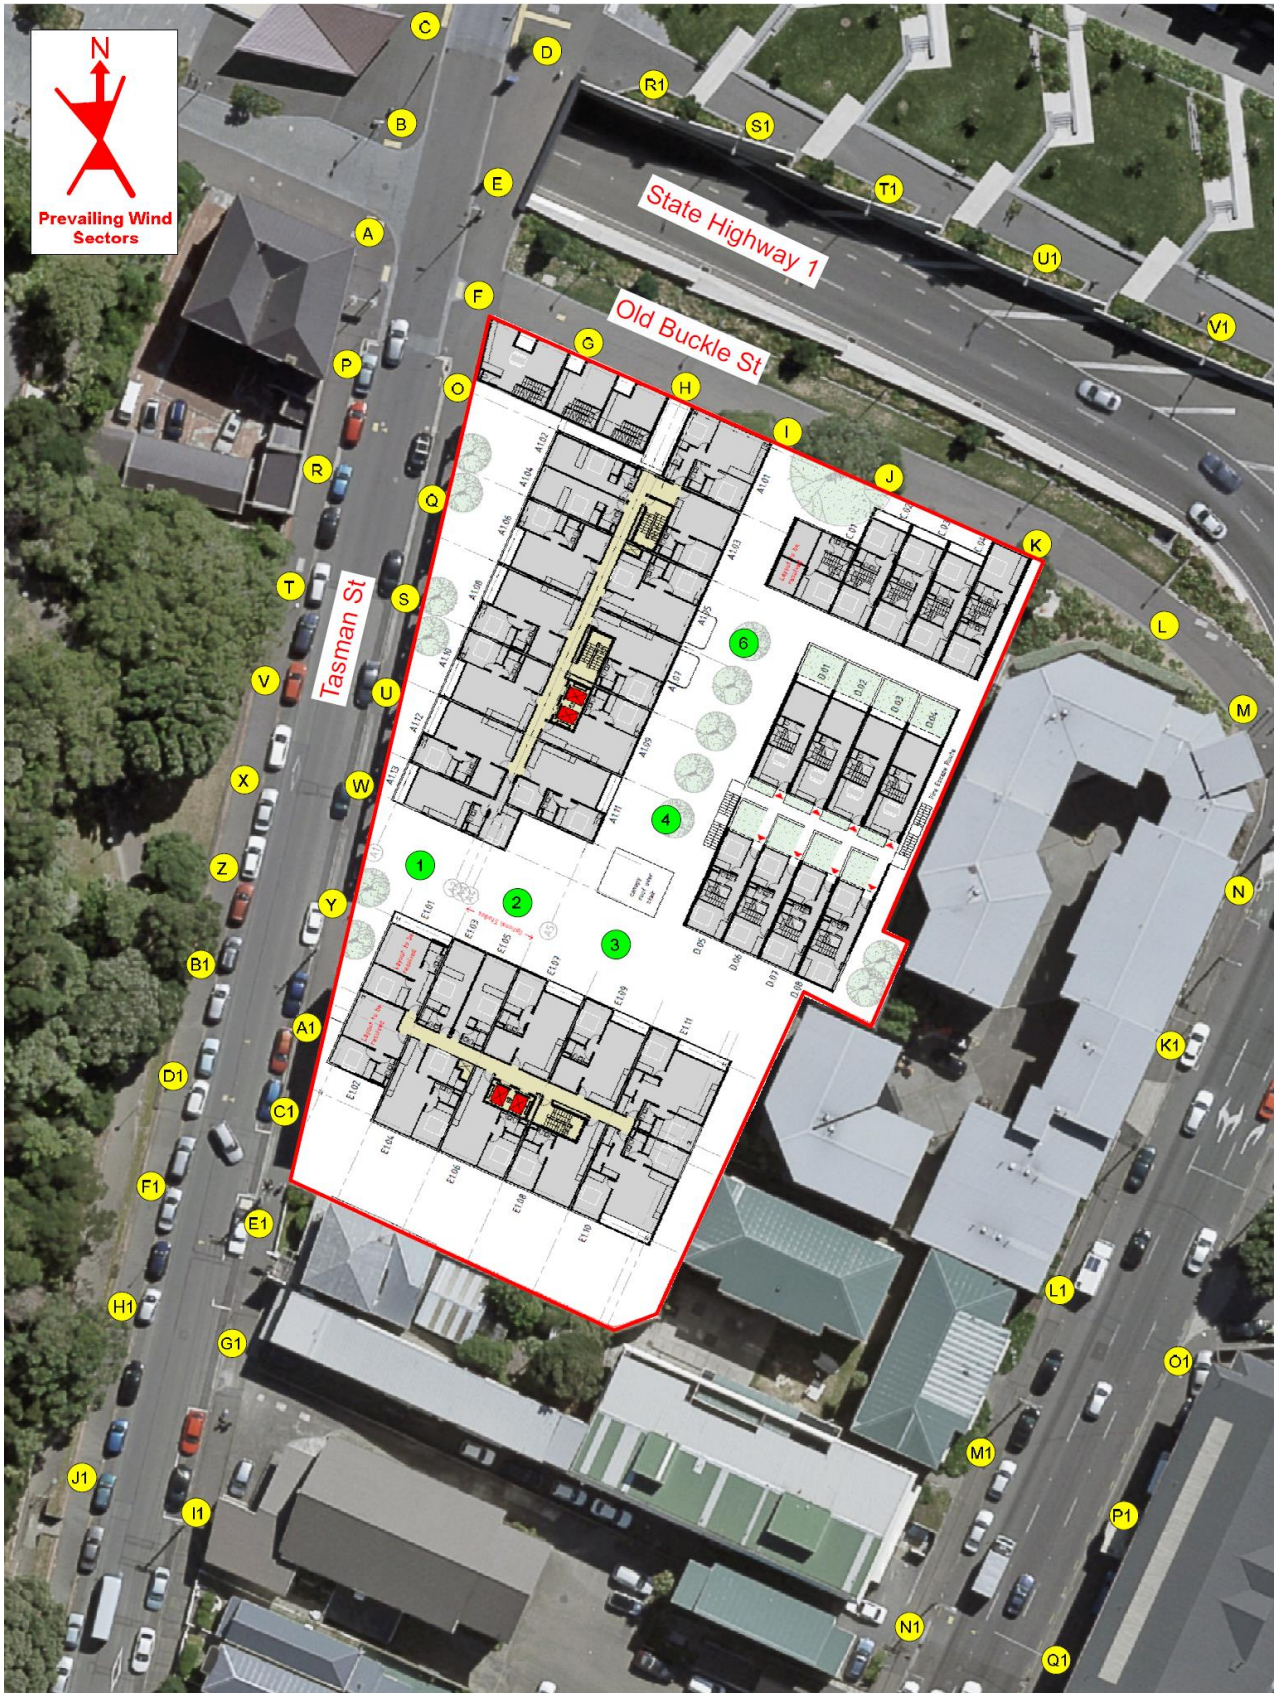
Site and surrounding area (aerial image - LINZ, 2021)
